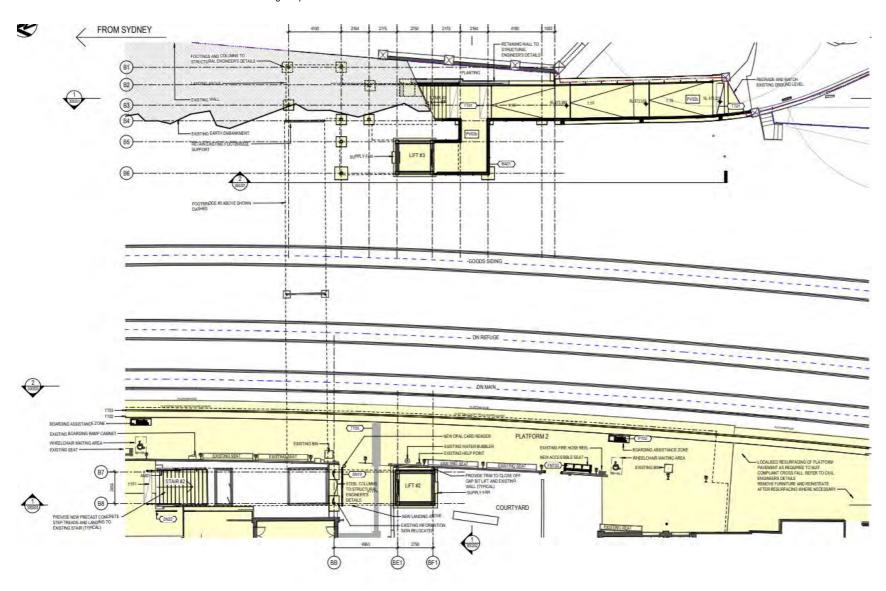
Station and Argyle Street – street level plan (Architectus, drawings dated 19/1/2024)
